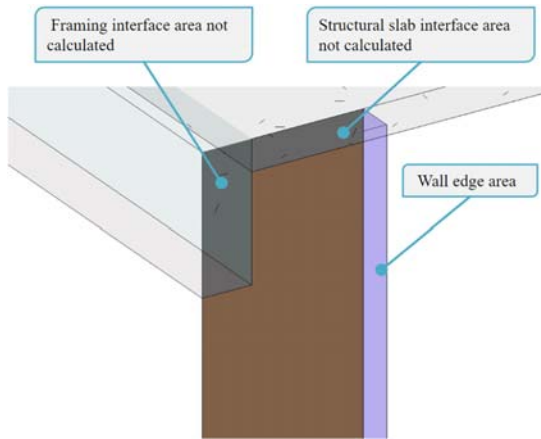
Formwork modeling for calculation: split the face to avoid calculating the interfaced area between walls, beams and slab
